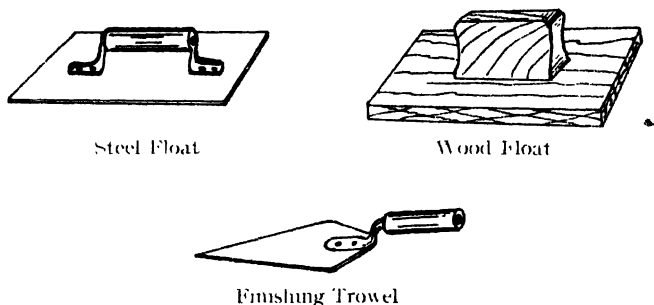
HAND TOOLS FOR CONCRETE WORK
